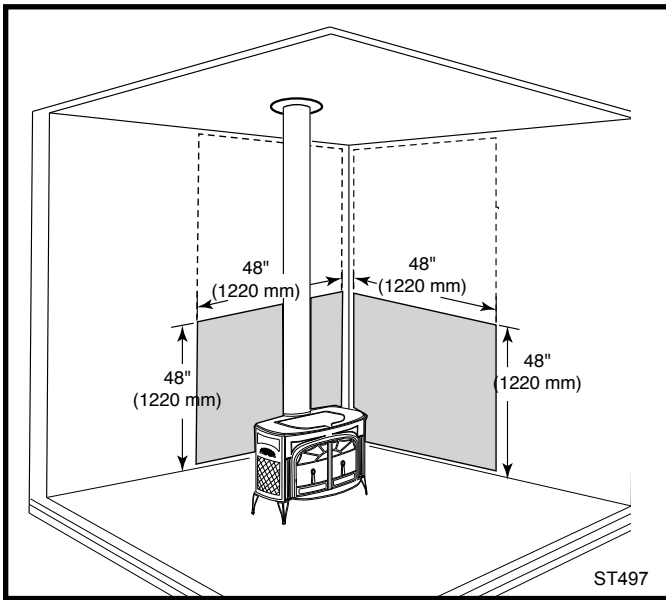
Parallel installation, vertical chimney connector, two wall shields. Reduced clearances for both rear and side walls. Wall shields may meet at corner if desired. Shielding for connector is centered behind connector.
